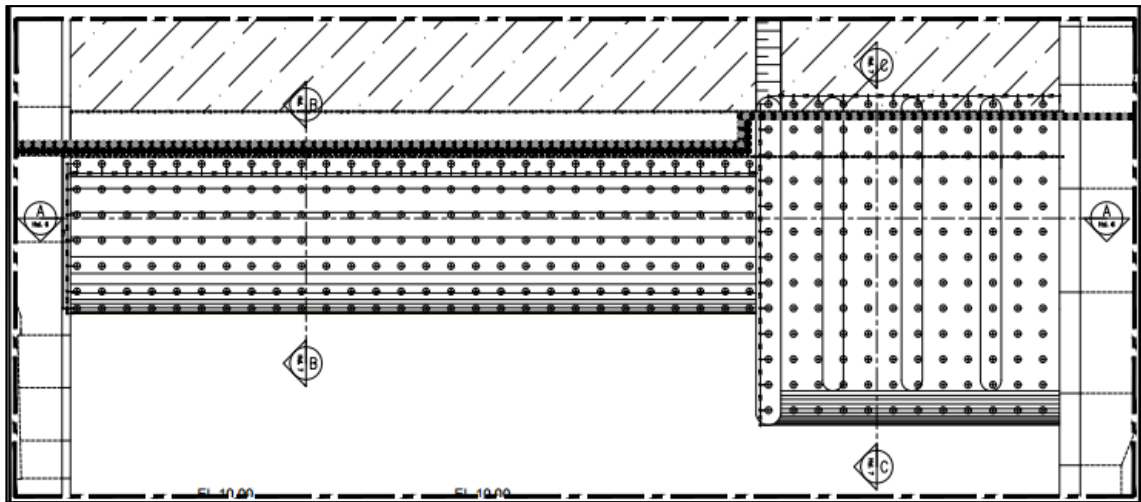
Bore pile foundation plan in spillway area of Margatiga Dam Project
